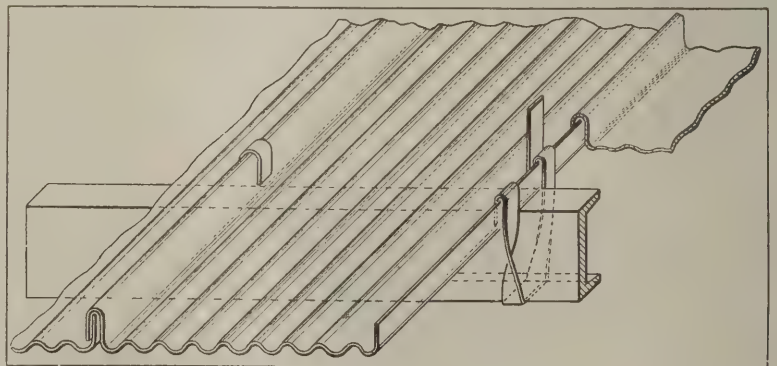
A New Corrugated Iron Roofing—Showing Manner of Applying to Purlins.
